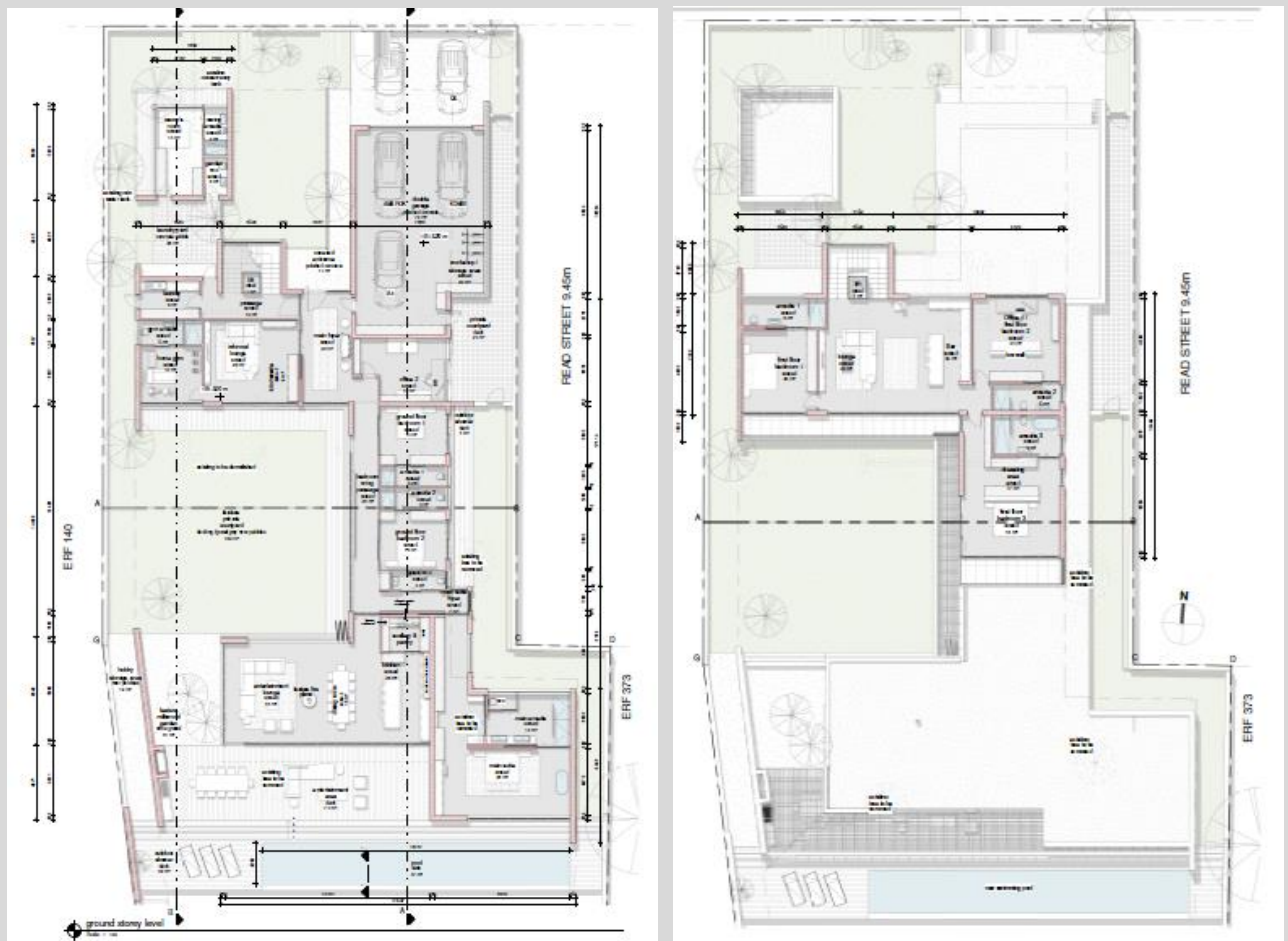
Proposed new dwelling (ground and first floor) (CLD Architects, 2021)
